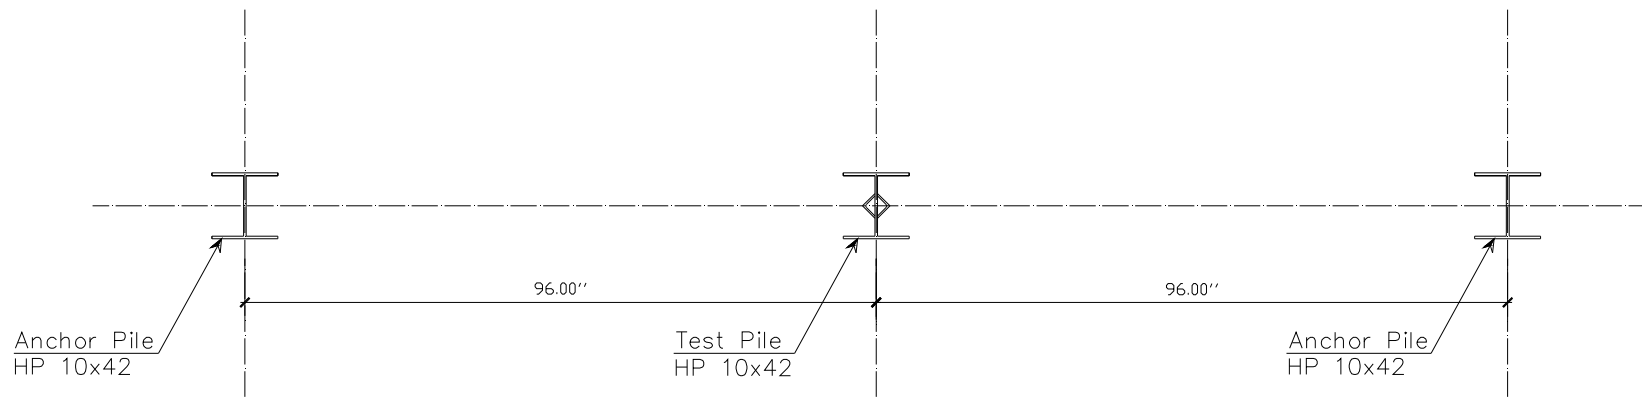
Typical Configuration of the Test and Anchor Piles used for Testing Piles in this Project
